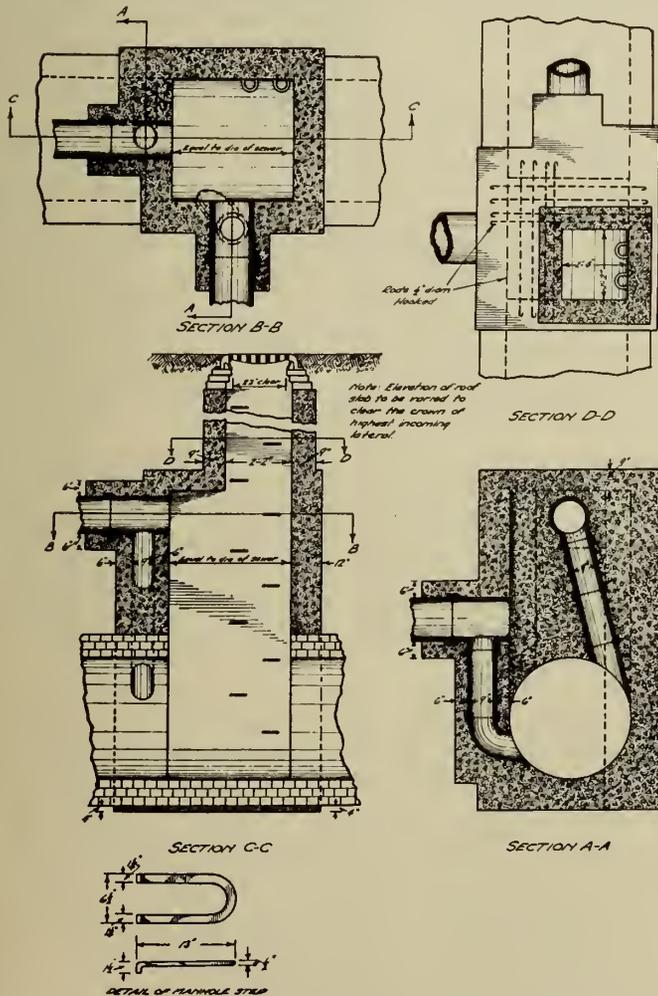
Standard Concrete Manhole with Drop for Trunk Sewers.
